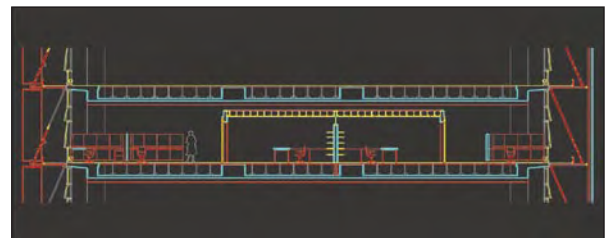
A cross-section of the building, in which air flows through windows that can be opened.
